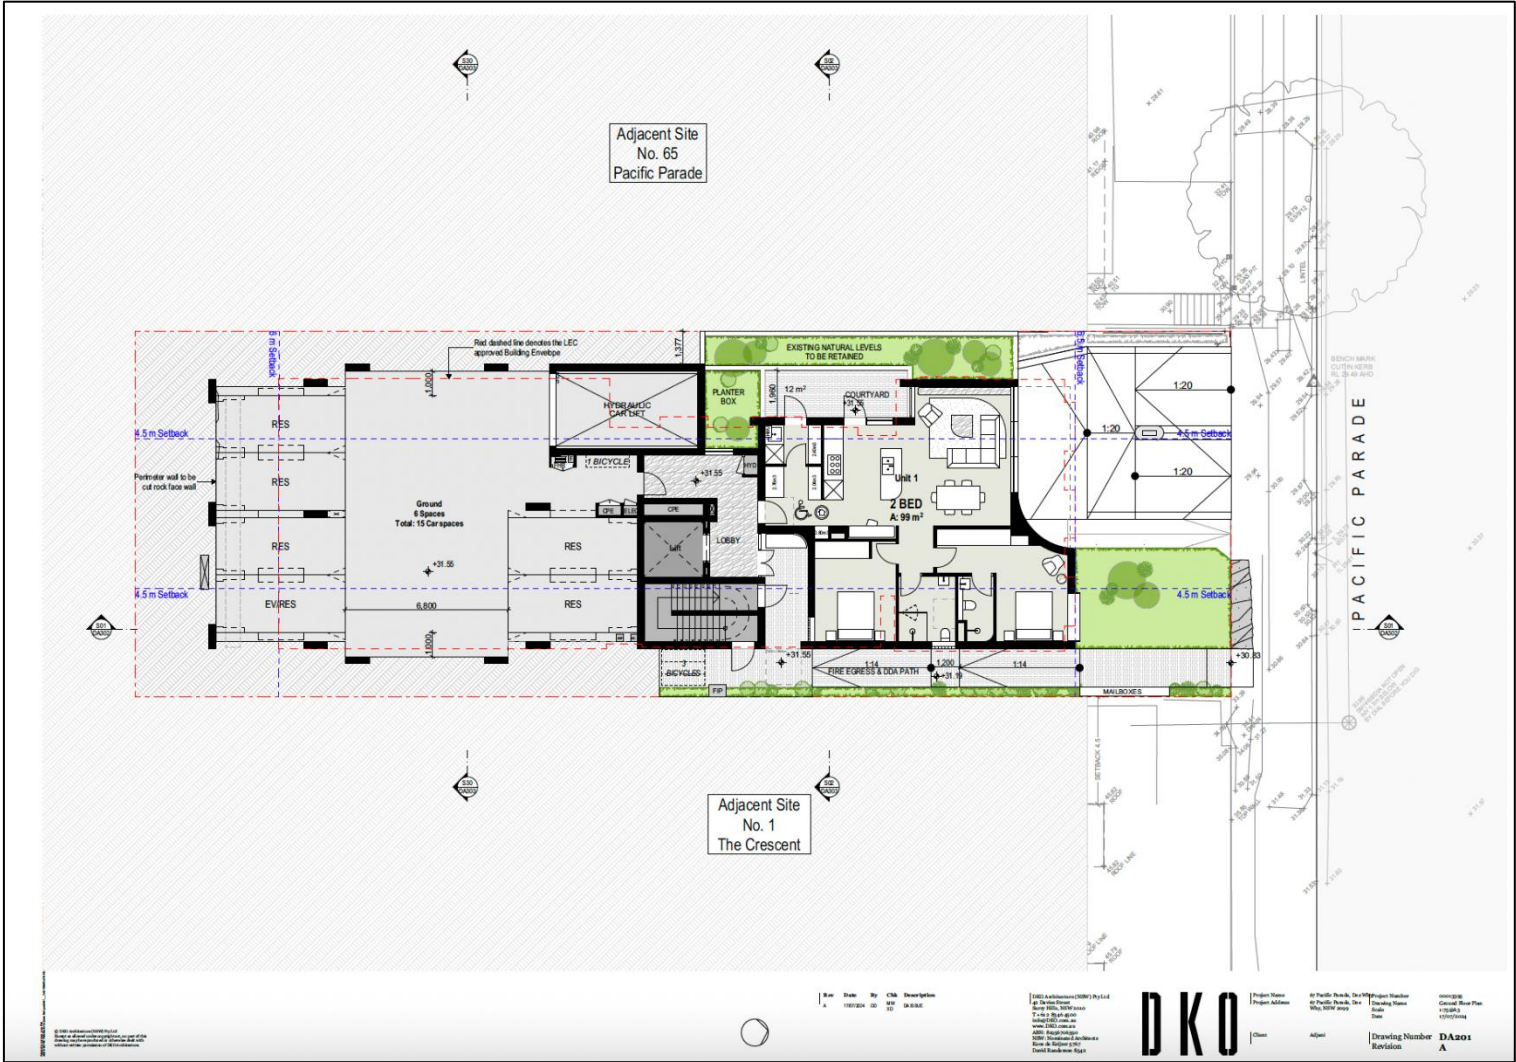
ILLUSTRATES PROPOSED GROUND FLOOR PLAN
